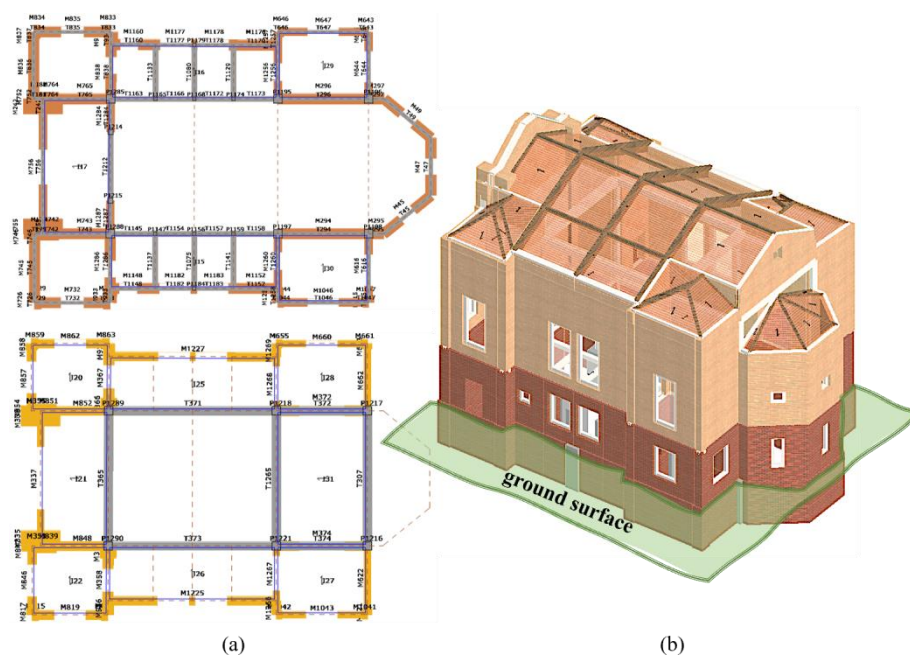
Ground floor and the first-floor layout of building model (a) and its 3D model (b)
